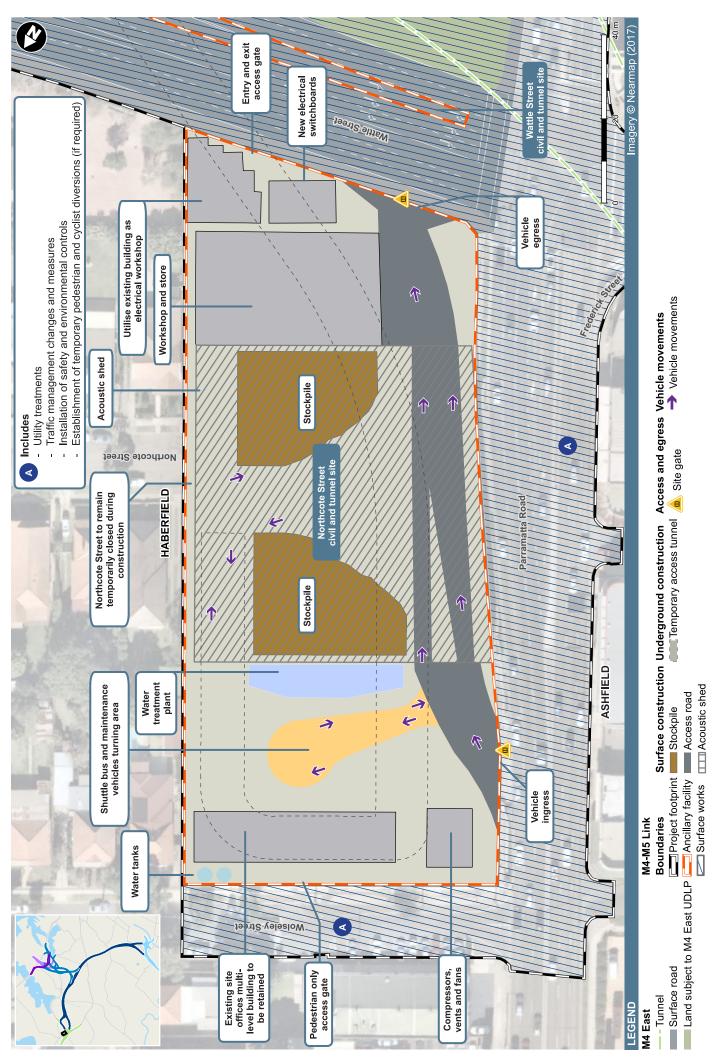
Indicative Northcote Street civil and tunnel site layout
